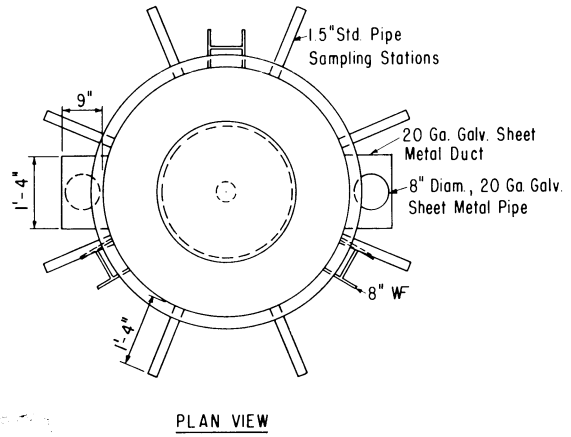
Outdoor test shelter and installation, 2 ft. bins
